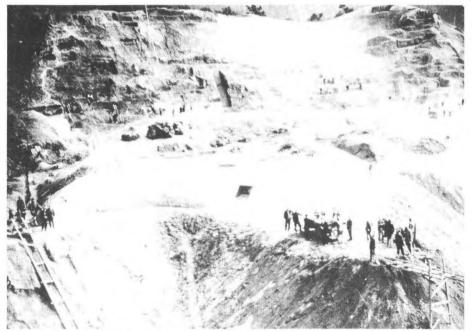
Central Western Town Belt 1932. Anderson Park extension under construction. Providing social welfare has played a large part in shaping the Town Belt. Land has been taken for hospitals, or hills have been flattened in the process of providing outdoor relief. Today the Rose Garden and Begonia House occupy this site.
